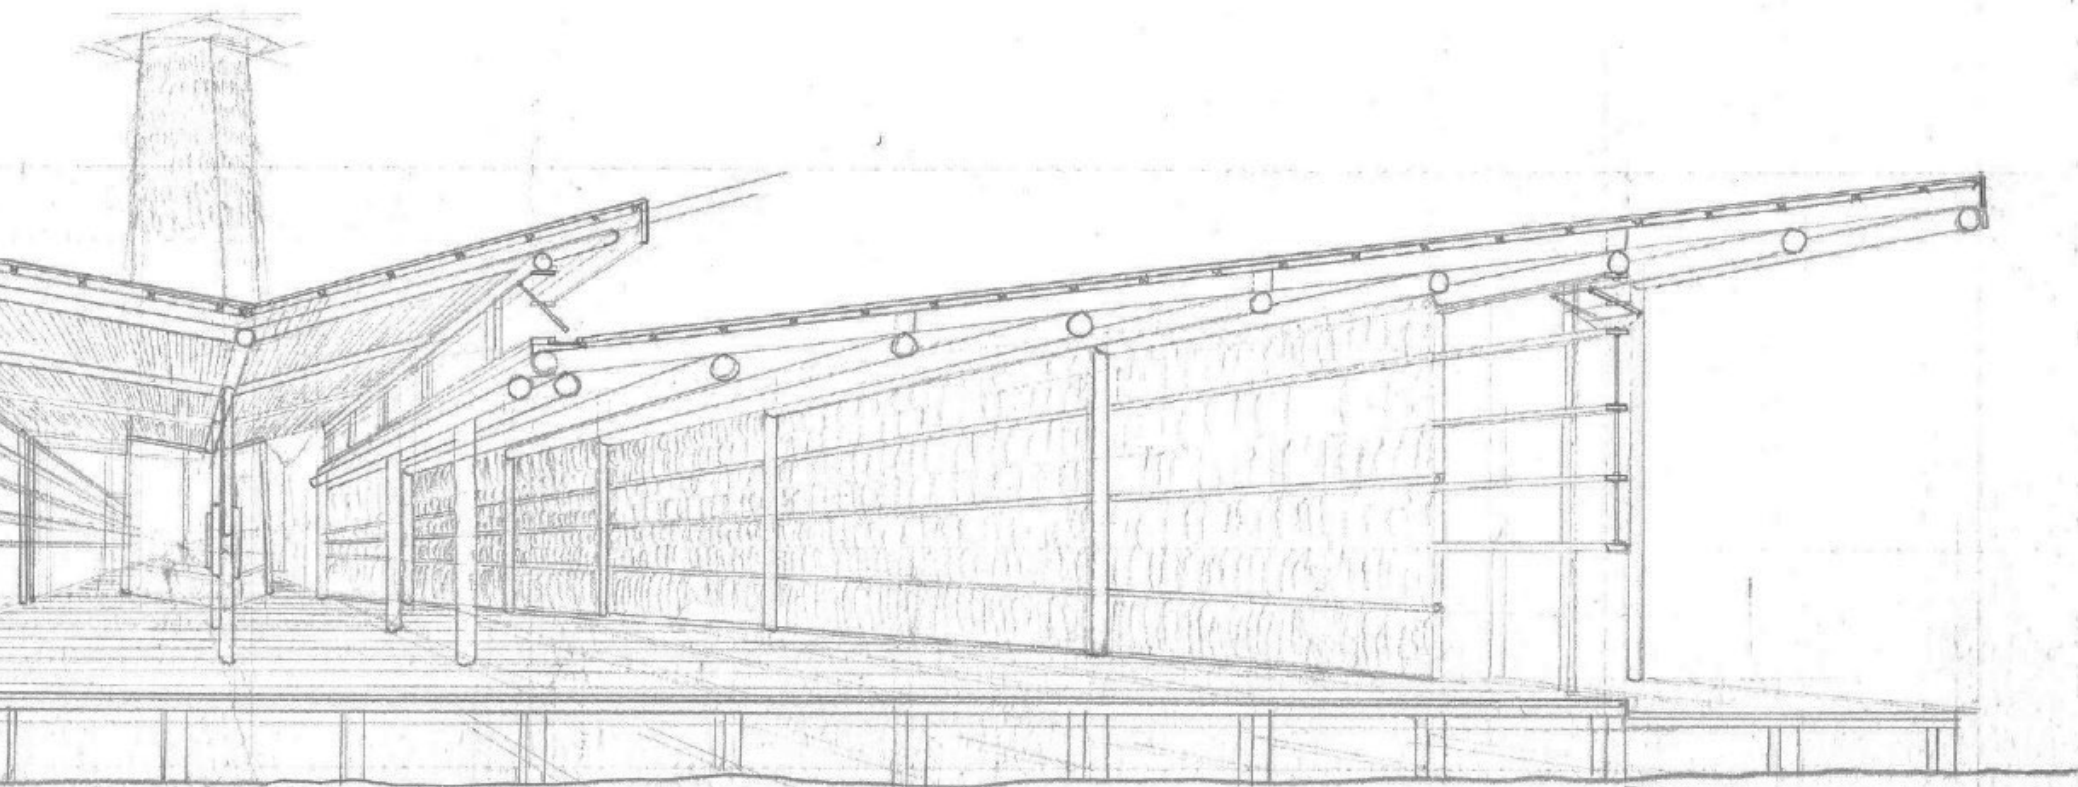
Section A-A on Prelim Plan (Author, 2021).
